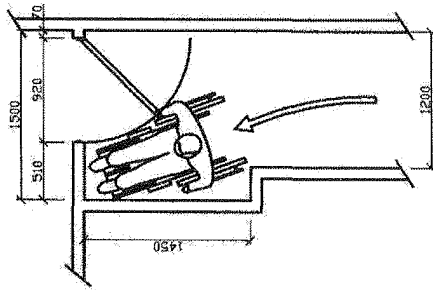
(c): Access to Doorway by Providing Corridor Width and Door Circulation Space from AS1428 Part 2-1992. This layout would be inexpensive to construct and would encroach little on the adjoining room space.
